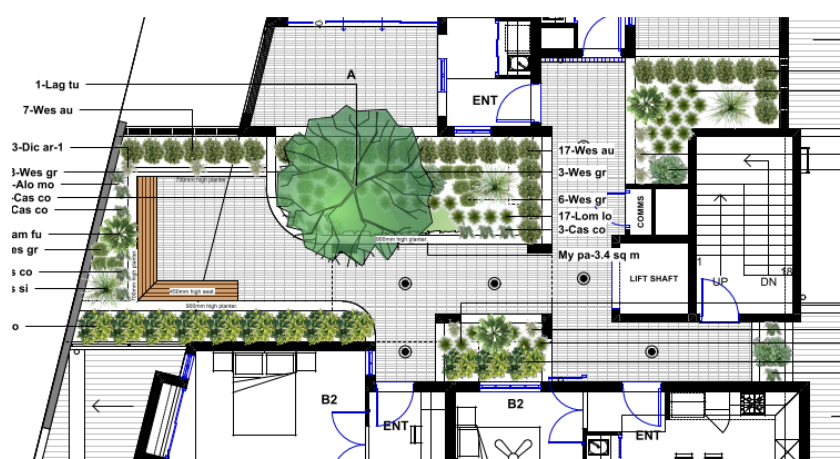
Extract of the proposed landscaping plan showing the communal open space.
